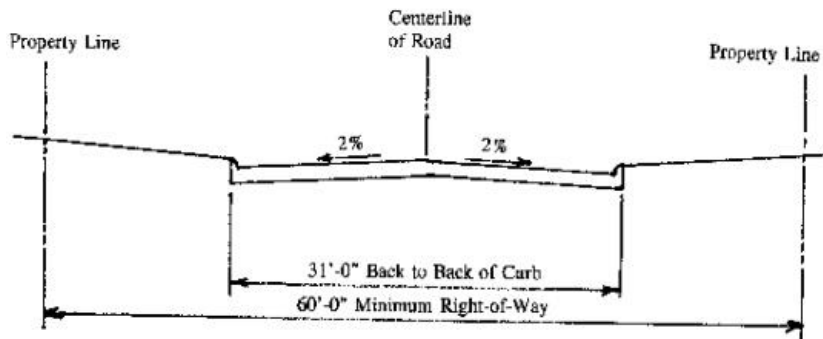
Typical Urban Road Cross Section (Pavement with Curb and Gutter)
